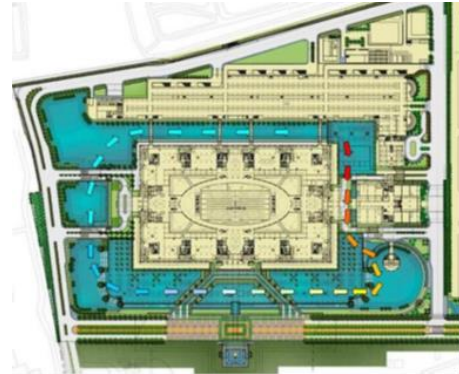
Cooling Pond around The Main Building (BM) - Plan
